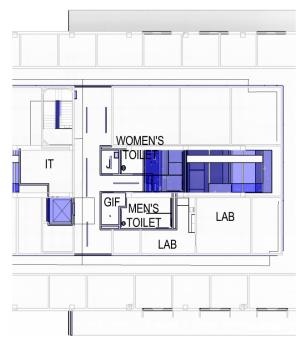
Phasing Diagram New Floor Plan, Level 4
